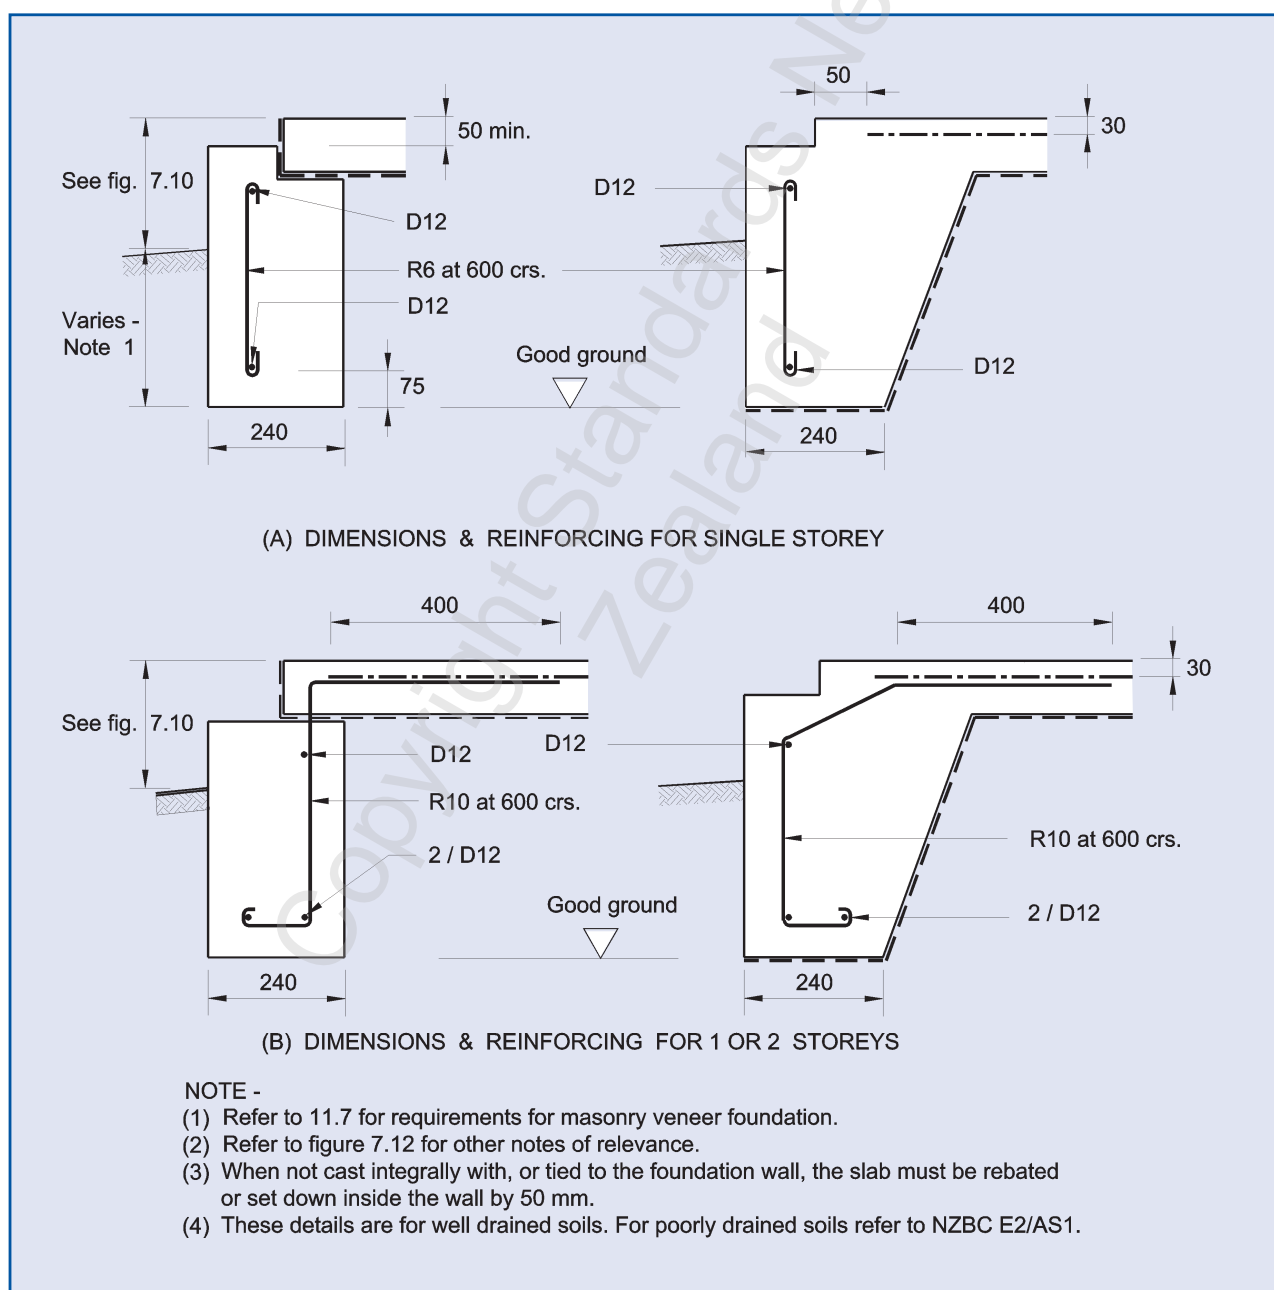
Masonry veneer foundation edge details –*In situ* concrete (see 7.5.2.3 and 11.7)
